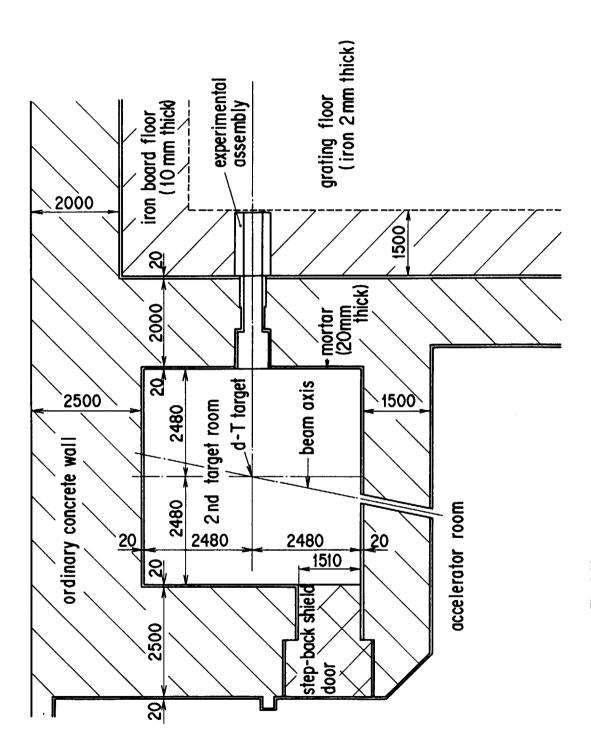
Horizontal section of the accelerator room, the experimental port and the Type 304 stainless steel assembly (unit in mm)
